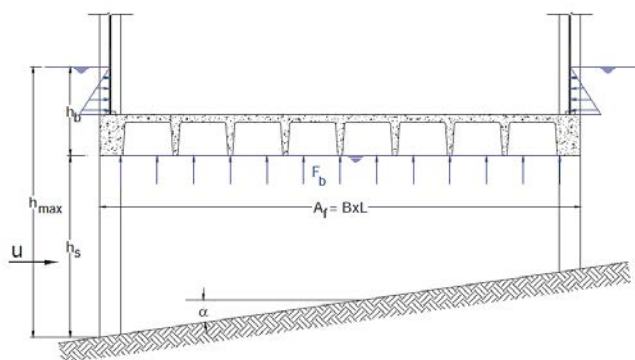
A definition sketch for upward buoyant force exerted on an elevated floor (FEMA, 2008)
